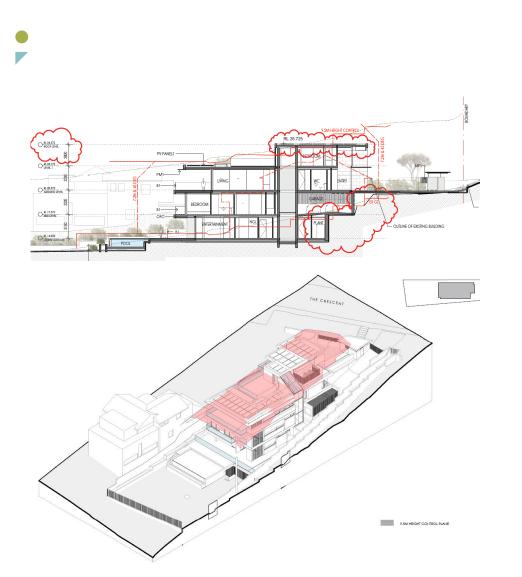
Section (above) and 3D height blanket (below) detailing the height encroachment of the proposal
